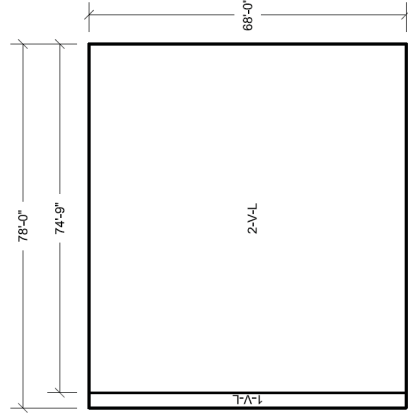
H.6-72: PUMP HOUSE INTERNAL EAST WALL LOOKING WEST
